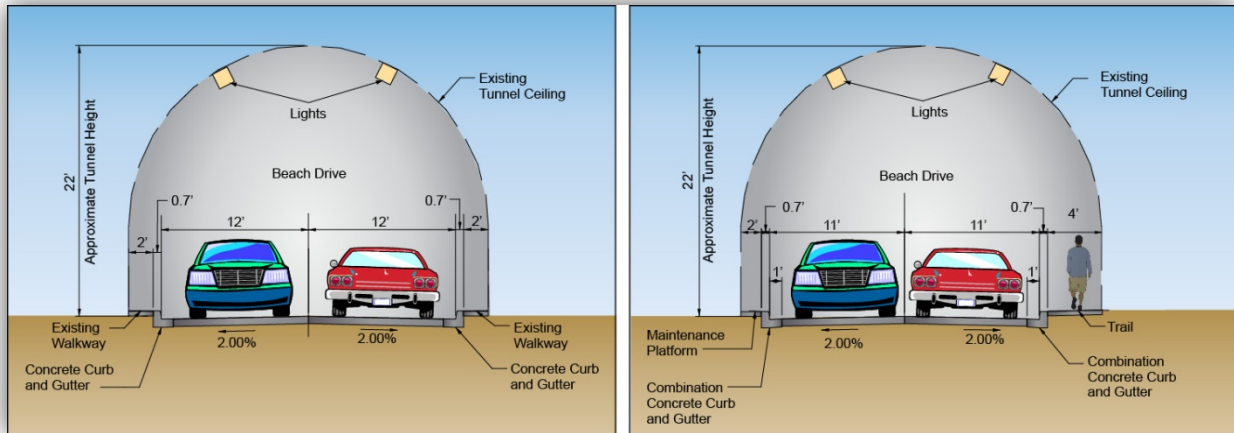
Beach Drive Tunnel Existing Conditions and Proposed Conditions
